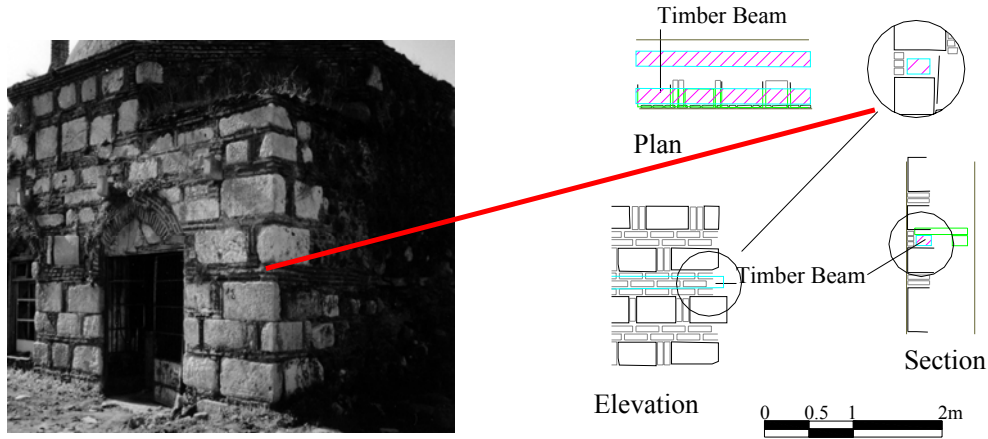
Seferihisar Büyük Hamam, North and east elevation, The use of timber beam
